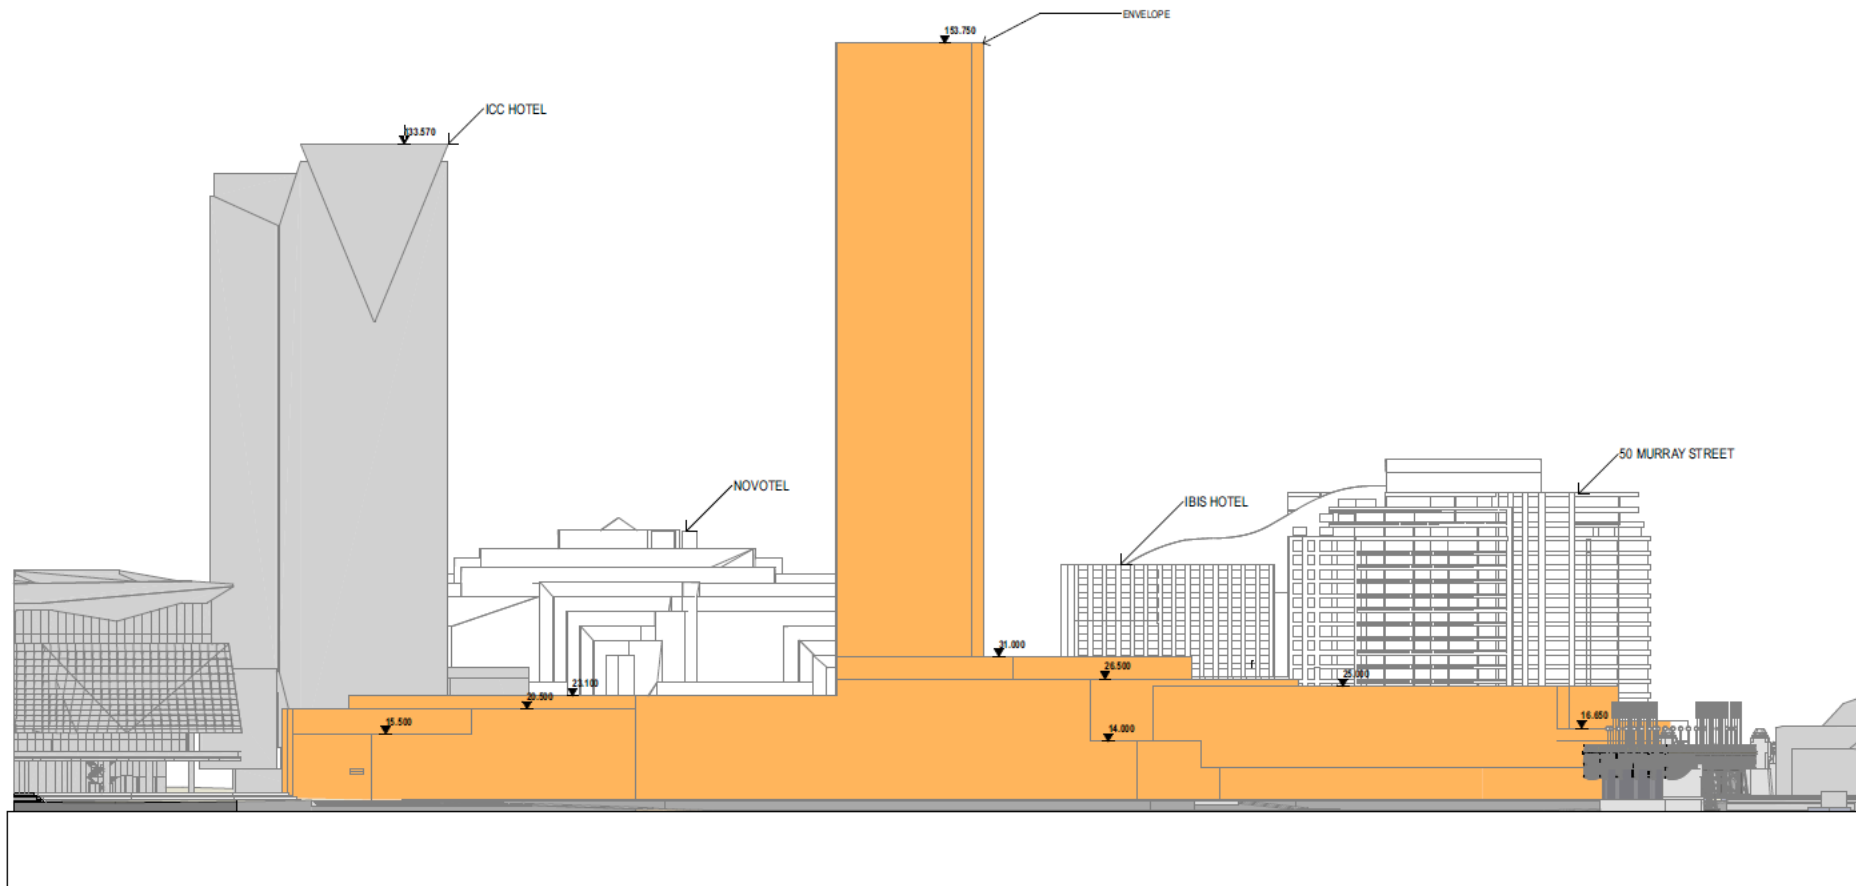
Envelope East Elevation (Source: FJMT, 2020)
